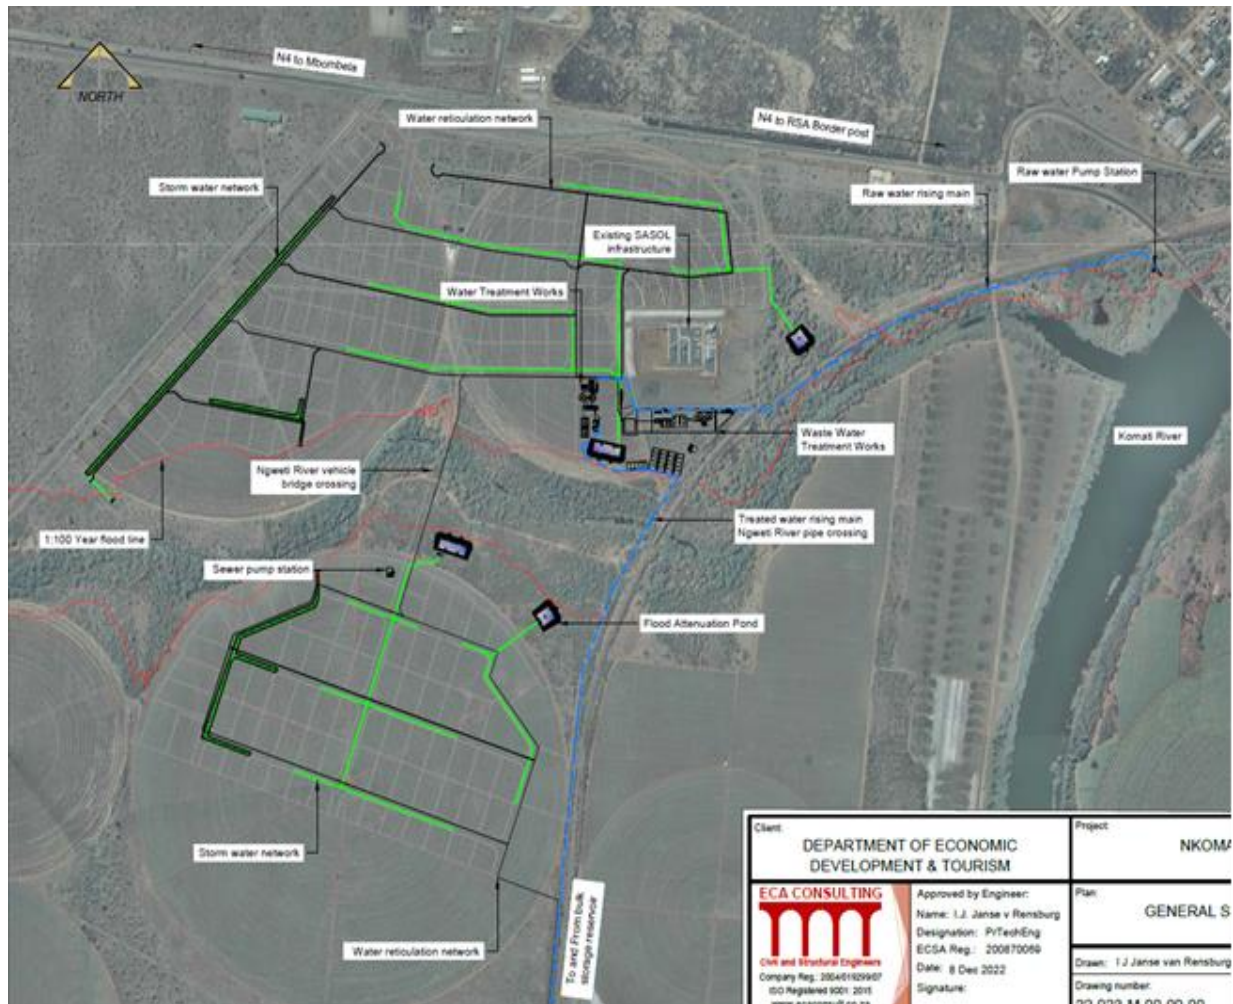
Site layout of sewer, potable water and stormwater bulk infrastructure
